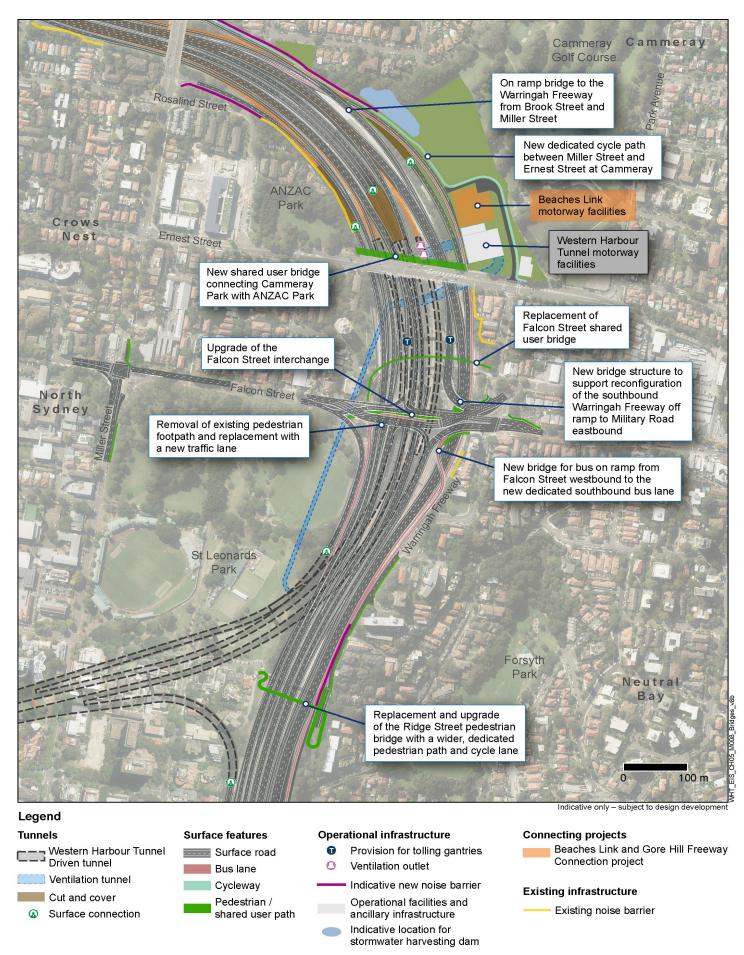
New, modified and relocated road bridges of the Warringah Freeway Upgrade component (map 2)
